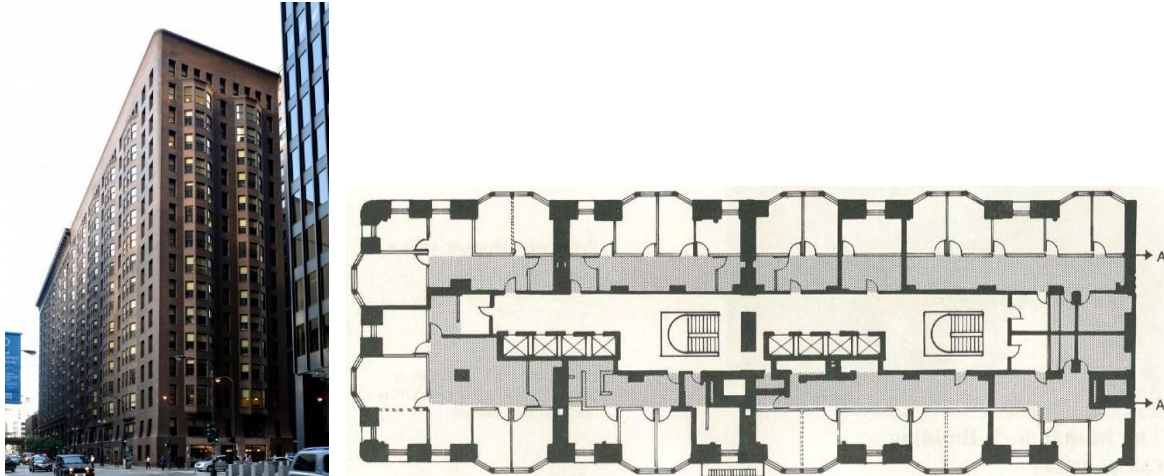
Monadnock Building (left) (URL-1), Monadnock building plan (right) (URL-2)
